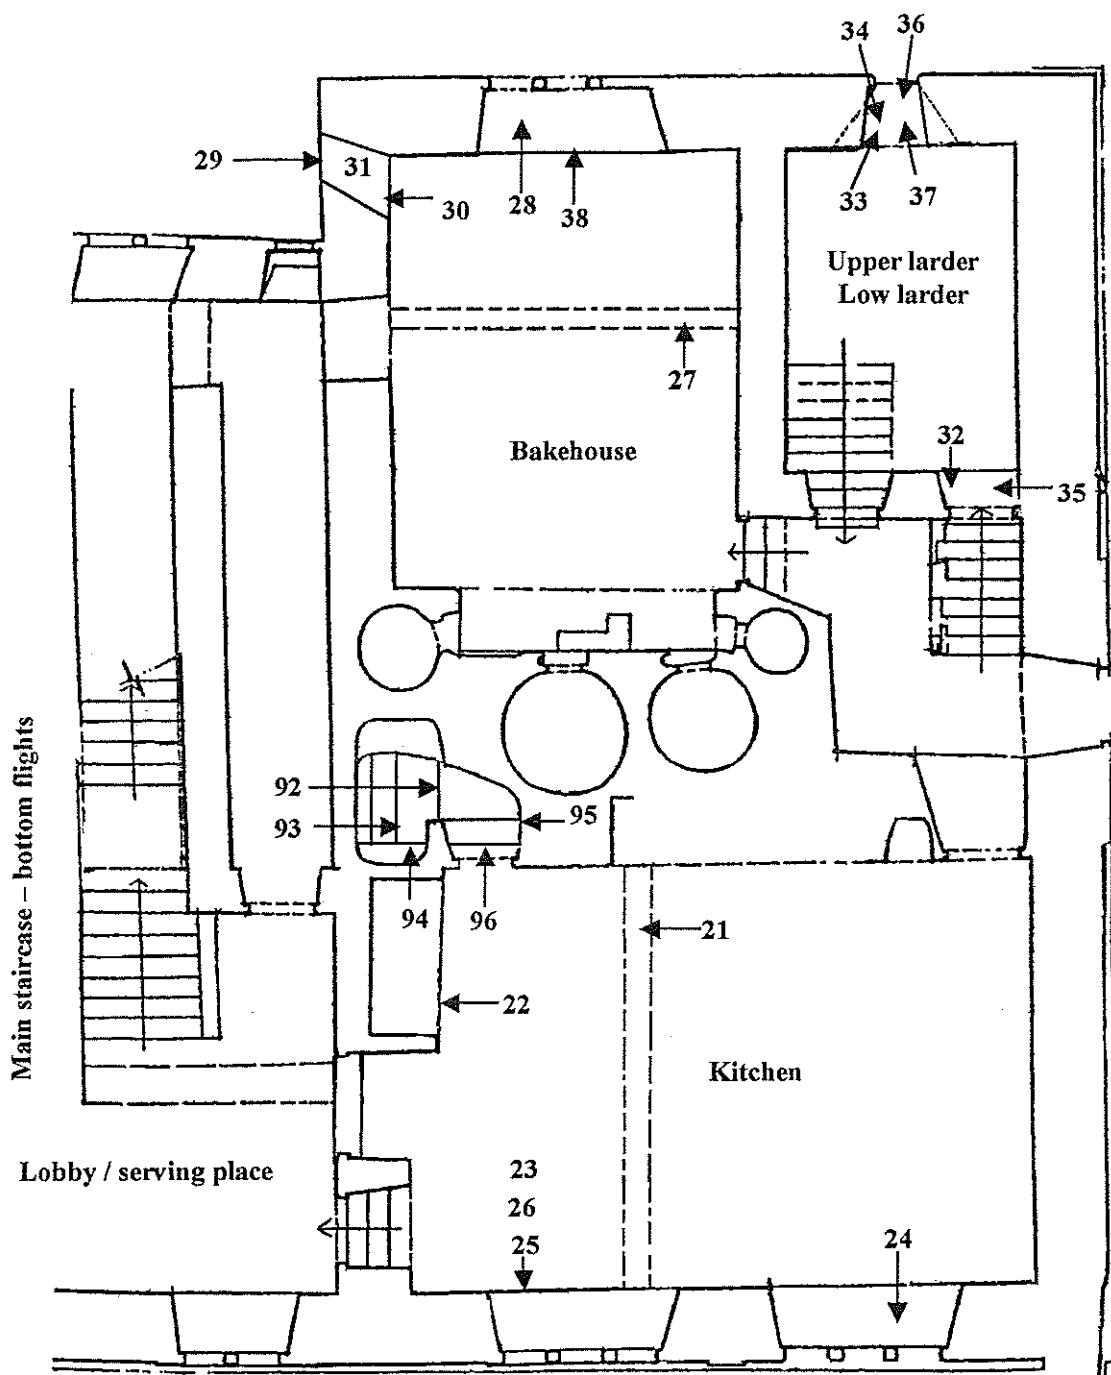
Plan of lower main staircase and ground floor service rooms to show sample locations
